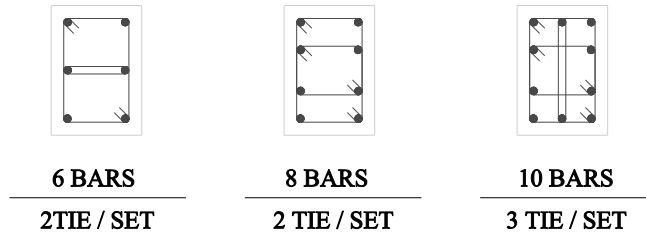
Arrangement of column steel (Rissman and Rissman Associates, 1965)
